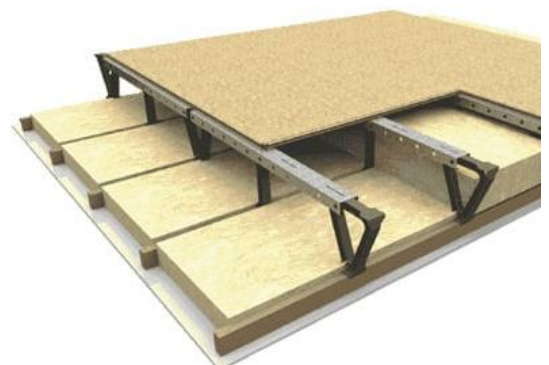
Example of a proprietary system to raise loft boards above insulation Ref LoftZone StoreFloor system.
